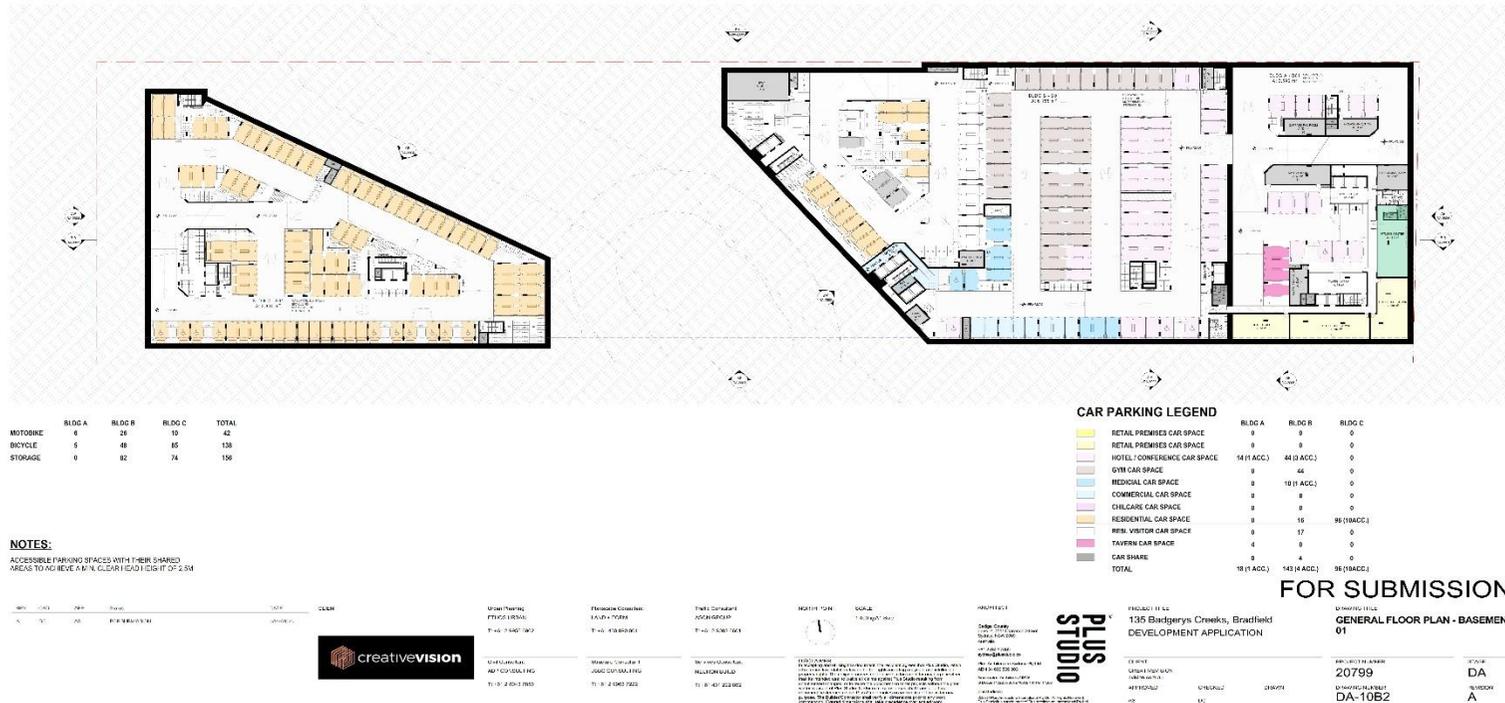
Ground Floor Plan – Basement 01⁹⁷
